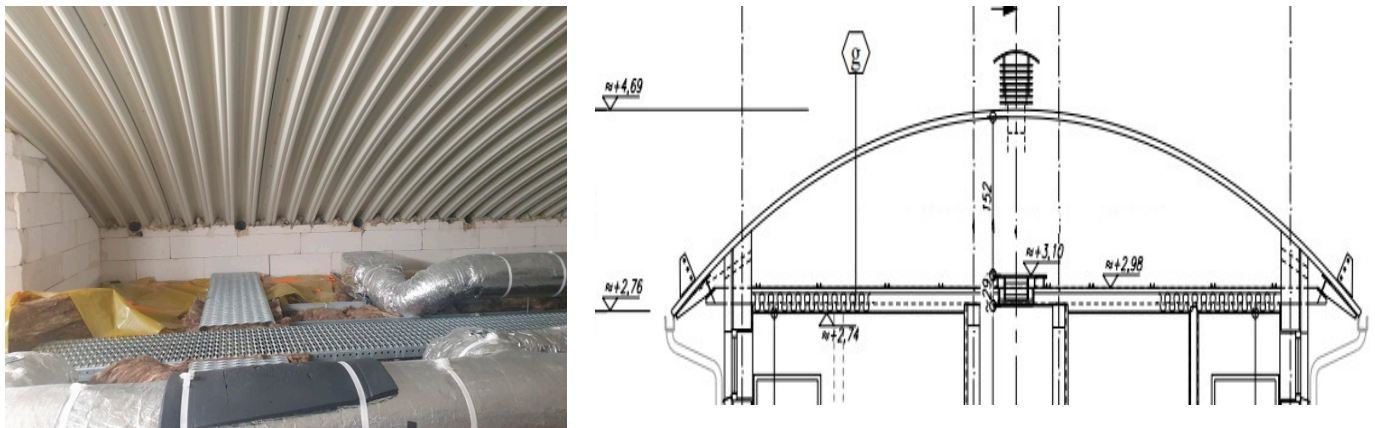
Geometrically complicated roof space in a ventilated roof (analysed here).
